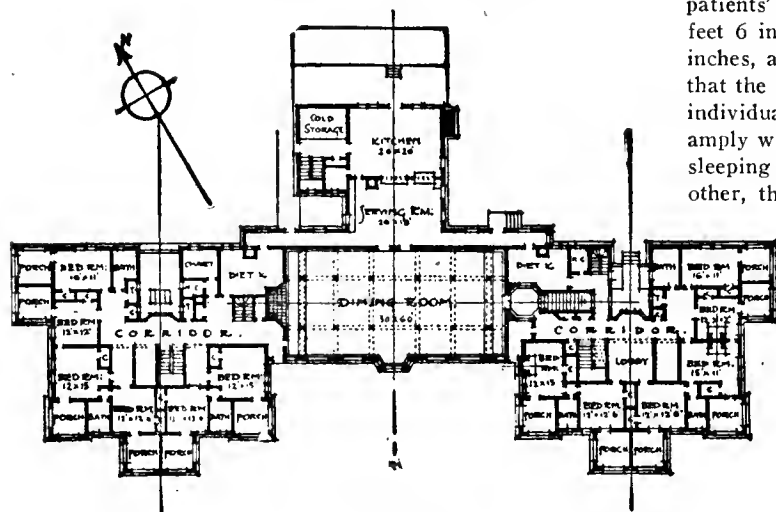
Plan of principal floor, main building: patients' suites grouped around dining room, office, kitchen, service room and storage. Each suite consists of bedroom, closet, sleeping porch and bathroom.
